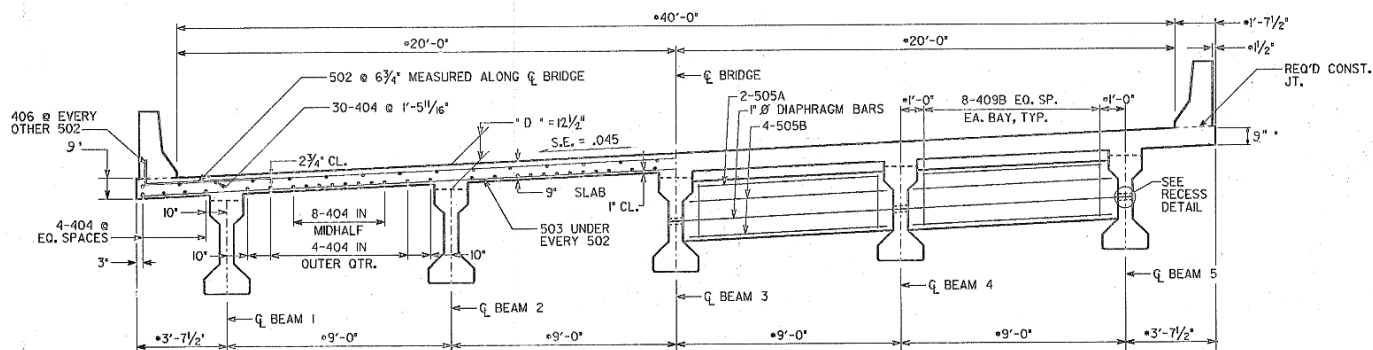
Superstructure Reinforcement Cross Section (Ref. GDOT Drawings)
